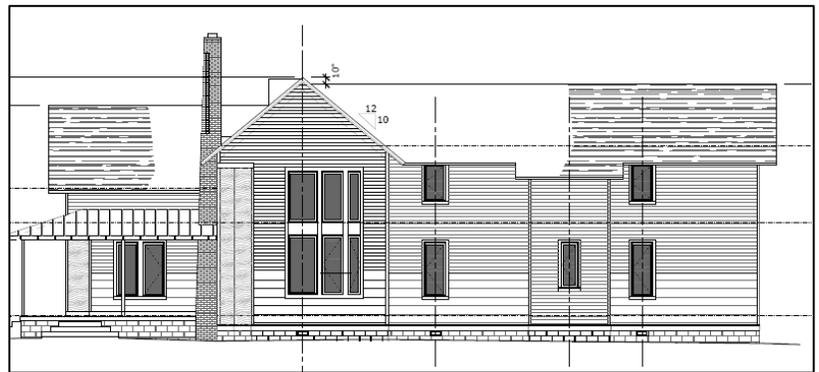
1521 Fatherland Street, proposed street facing side façade
